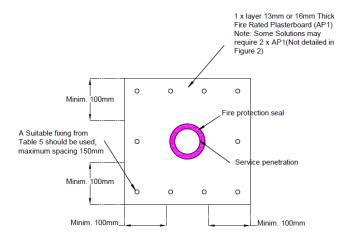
Elevation View for or additional protection AP1 in Korok panel systems
